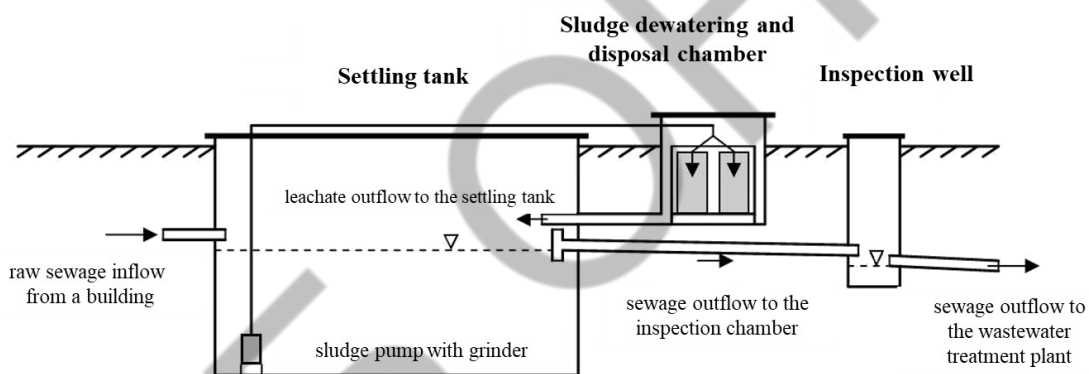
Technological scheme of the installation for dewatering and disposal of sewage sludge from the settling tank of the household wastewater treatment plant
